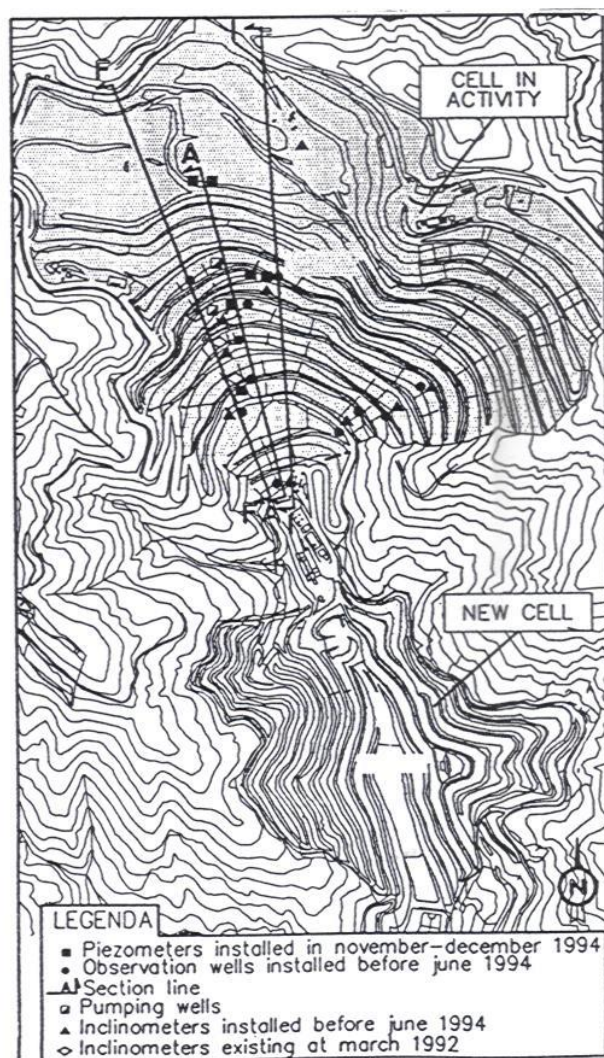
Plan view of Scarpino landfill with monitoring instrumentation – 1994.
